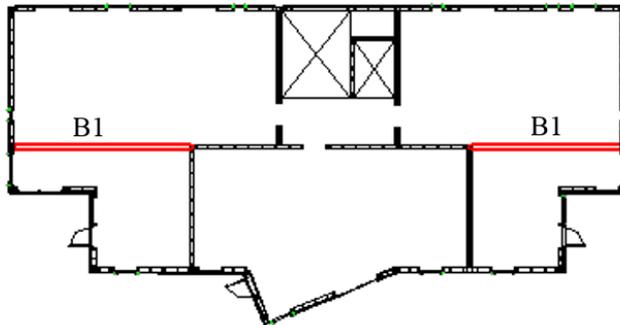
A plan view of the buildings structural system. The steel beams are marked B1.
